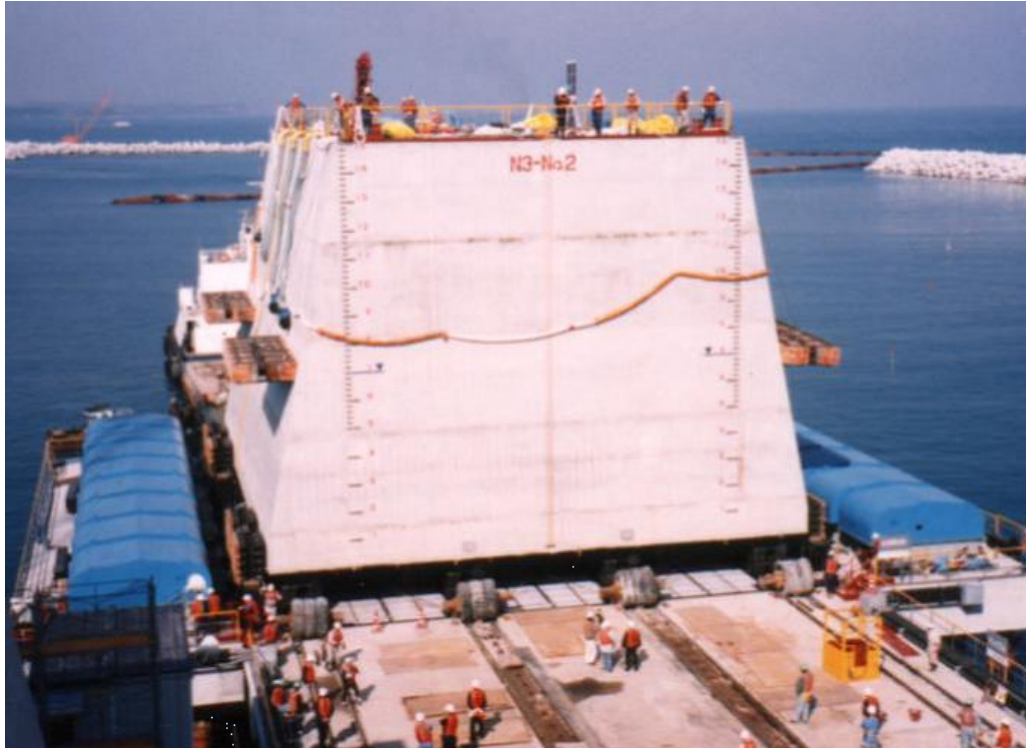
Syncrolift Launching Concrete Caisson (Photo courtesy of RRNMI)
